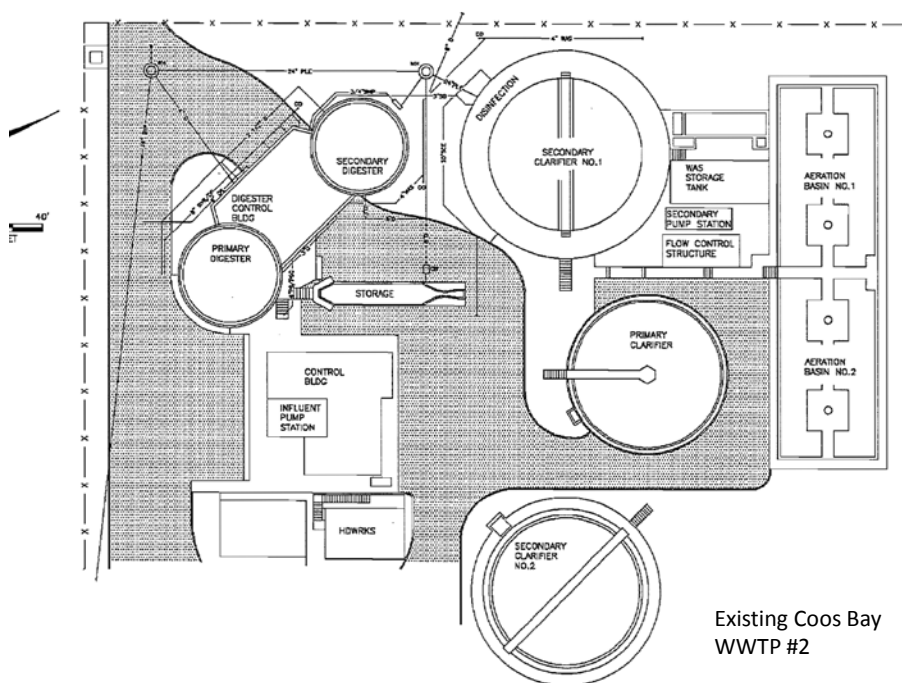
Existing WWTP No. 2 Plant Layout
